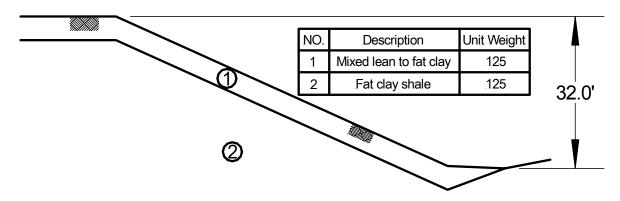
Design cross-section for I435-Wornall Road slope.
